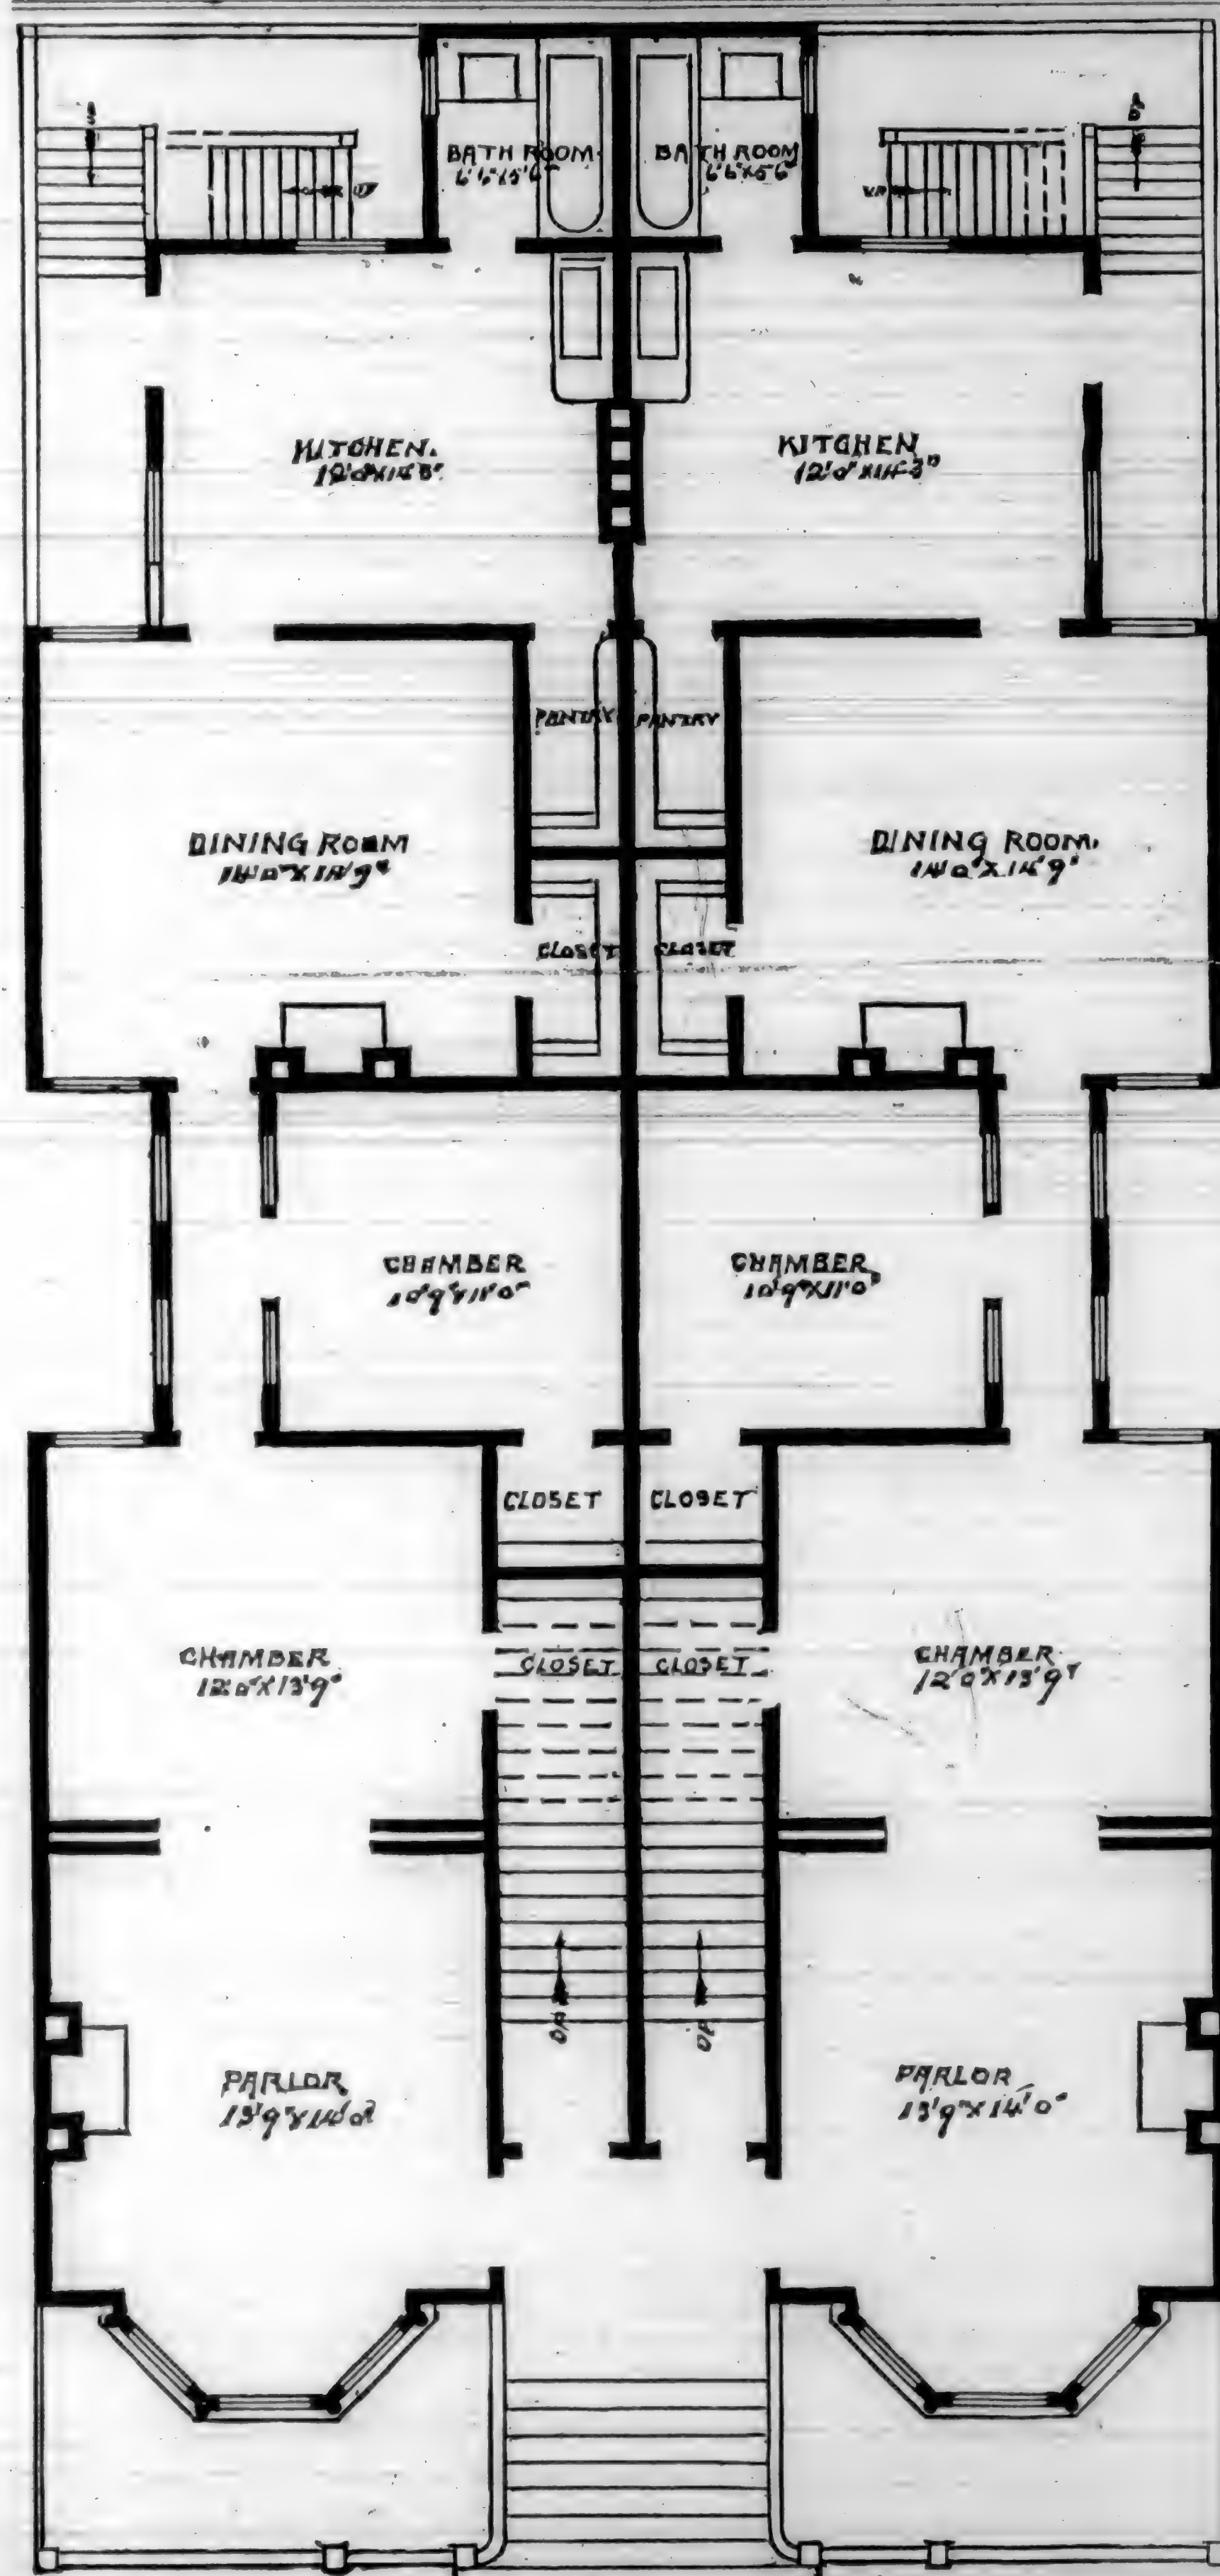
PLAN OF FIRST FLOOR 6-FLAT DWELLING. See "Our Illustrations."
